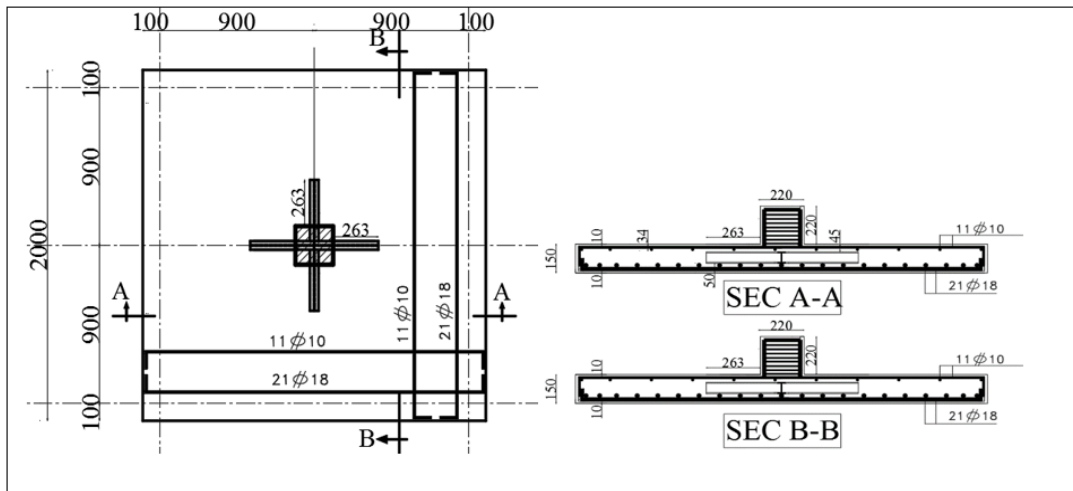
Reinforcement details of flat slab specimen "S-L1-2".
